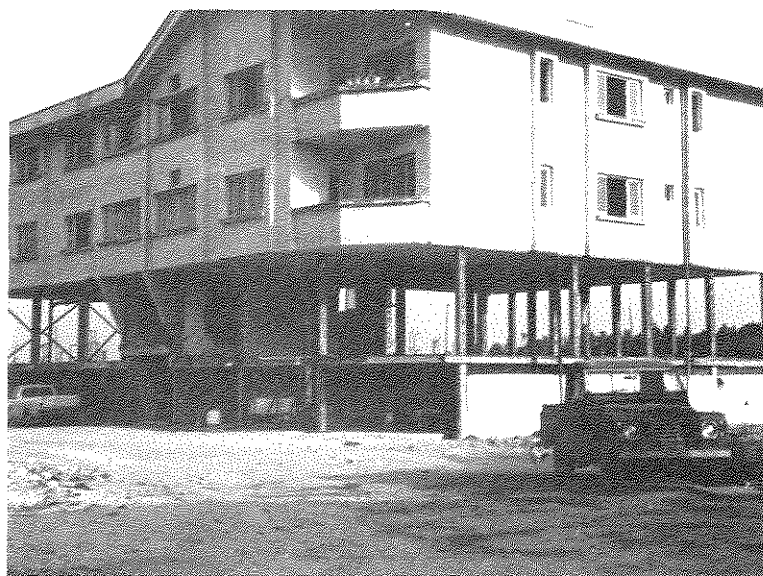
Damaged steel structure with inadequate bracing
